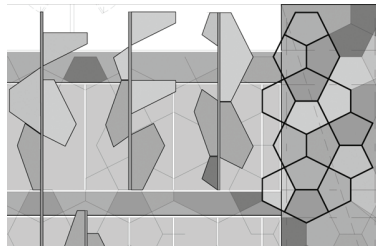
South elevation with Cairo tiling overlaid (source: VDM Consulting).
